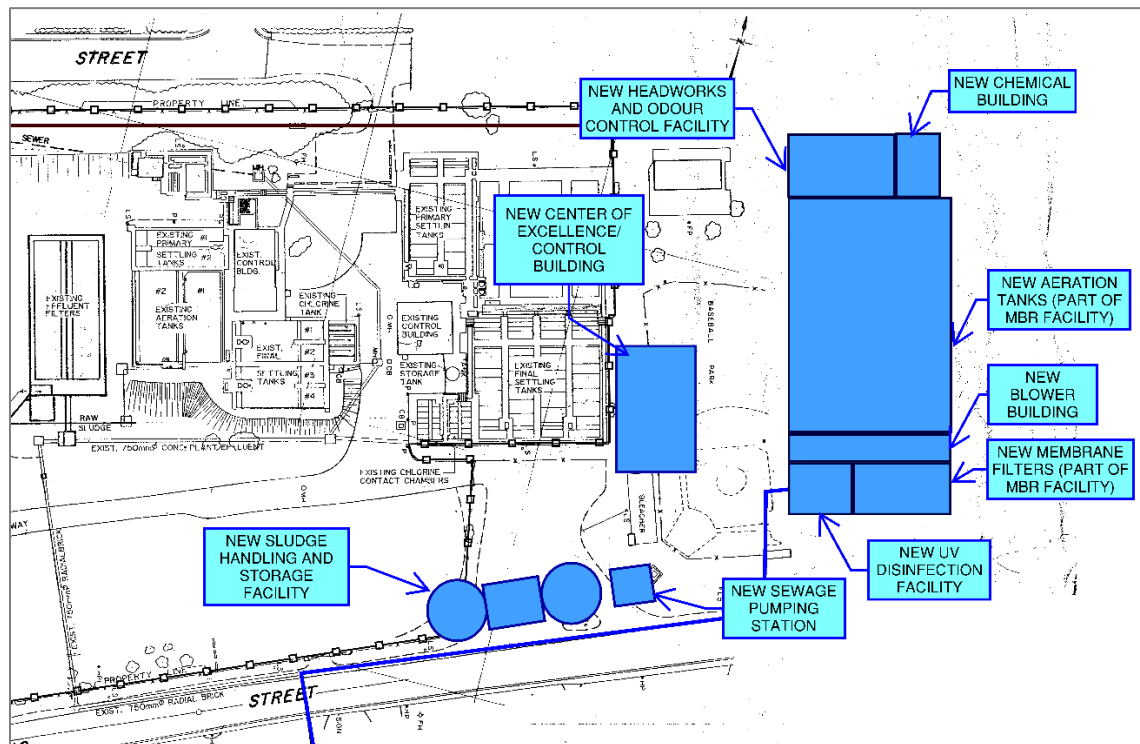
Site Layout B – Building within Park East of Existing Site
